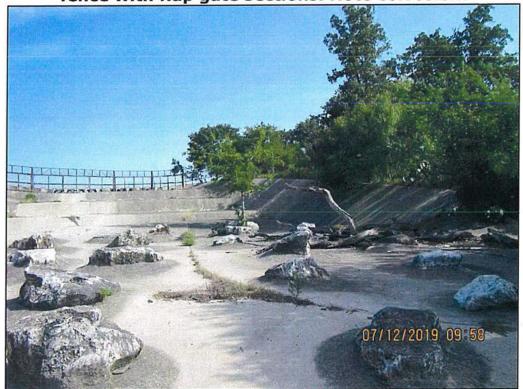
Service spillway. Looking upstream. Note vegetation.
